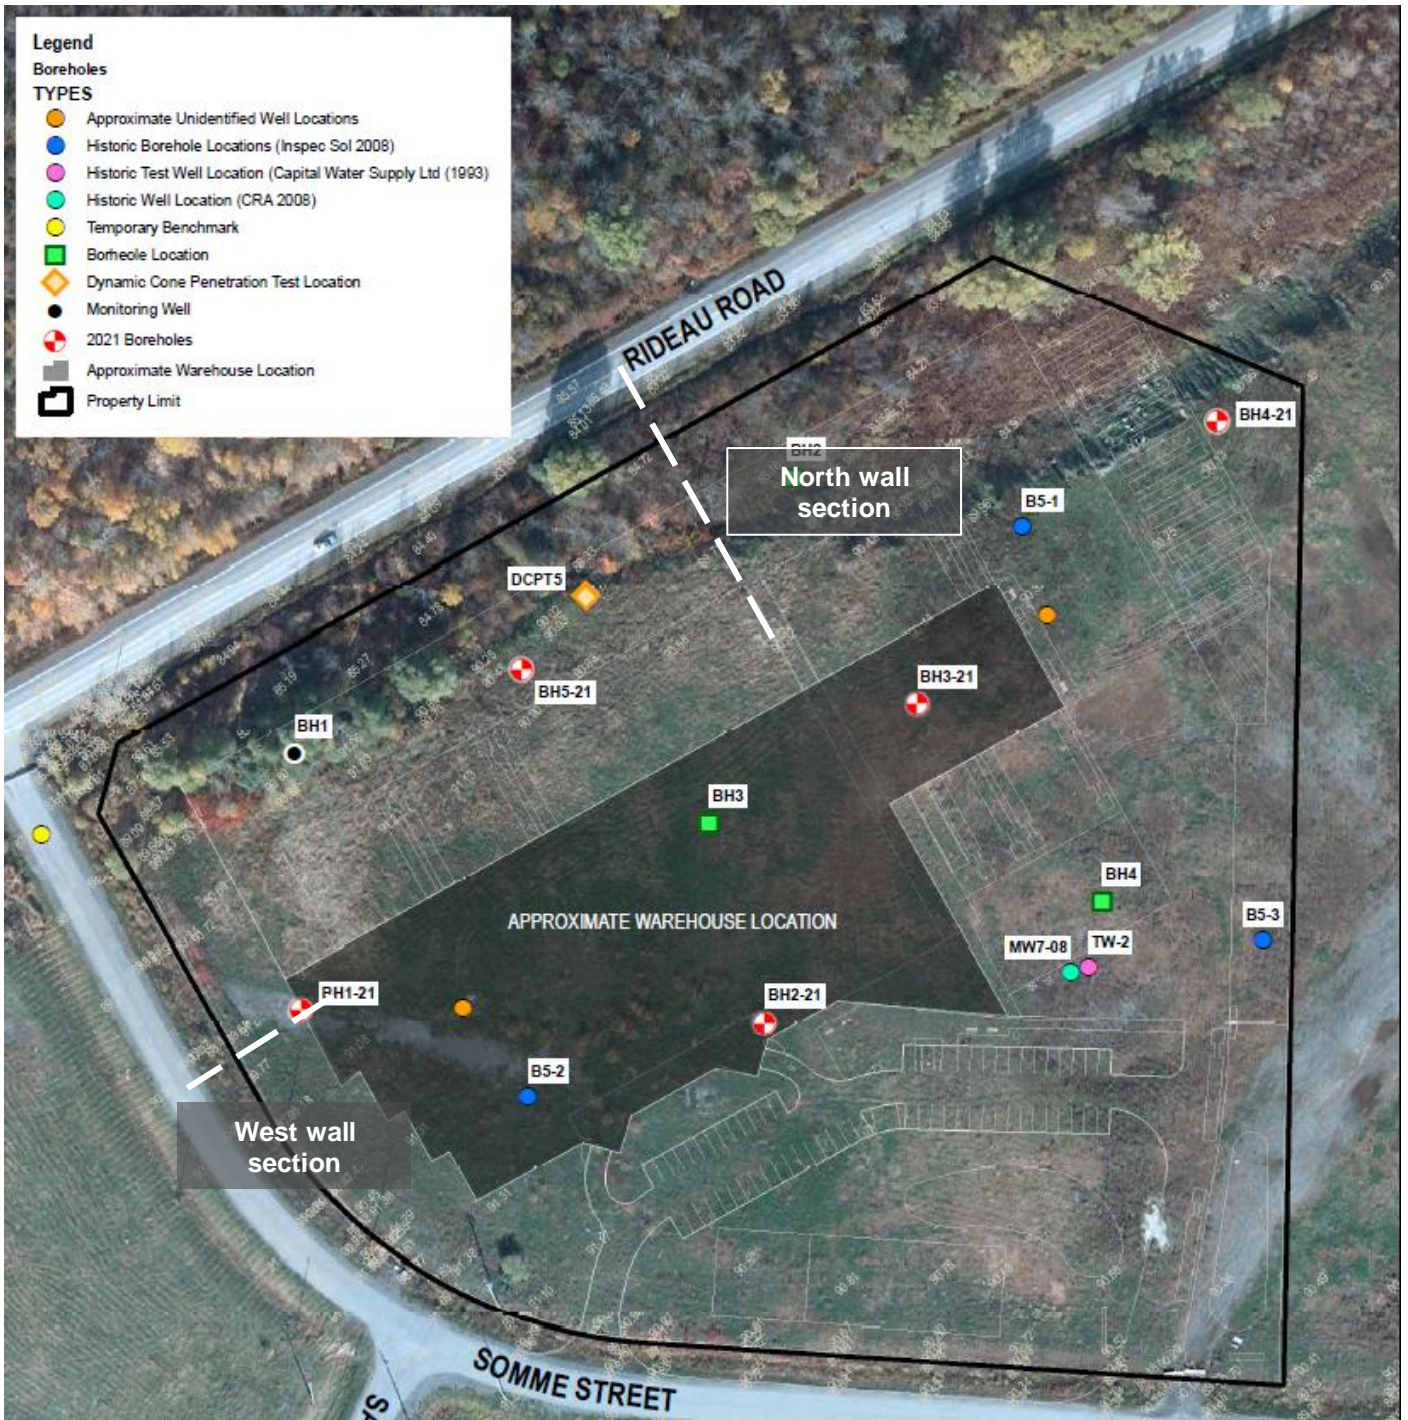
Site Layout showing the location of the analyzed cross sections and the proposed building footprint
